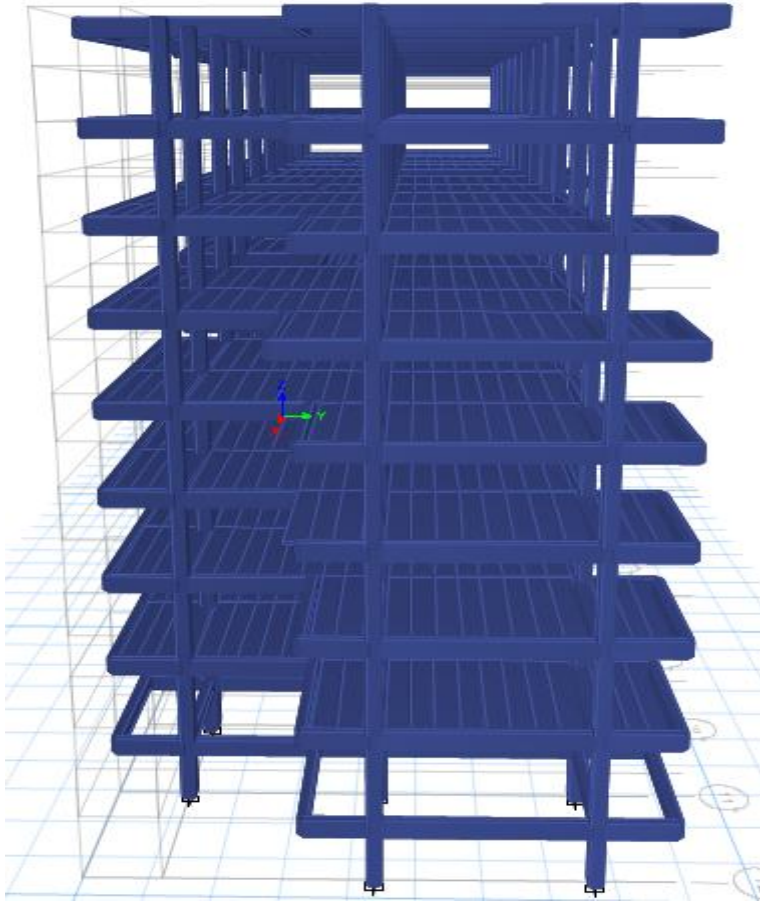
Three dimensional views for second bay of Eight Storey RC Building without shear wall
